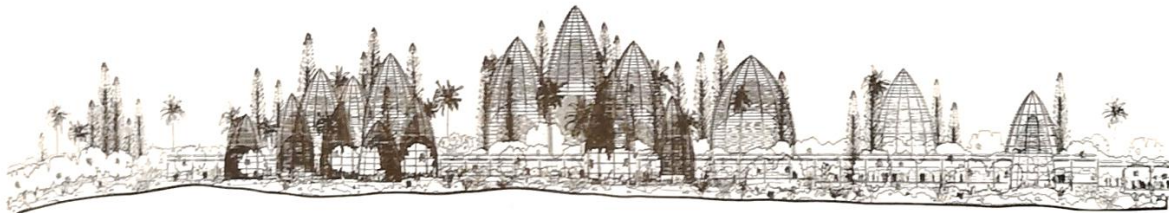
24: Elevation (Source: Buchanan, 1995: 198)
